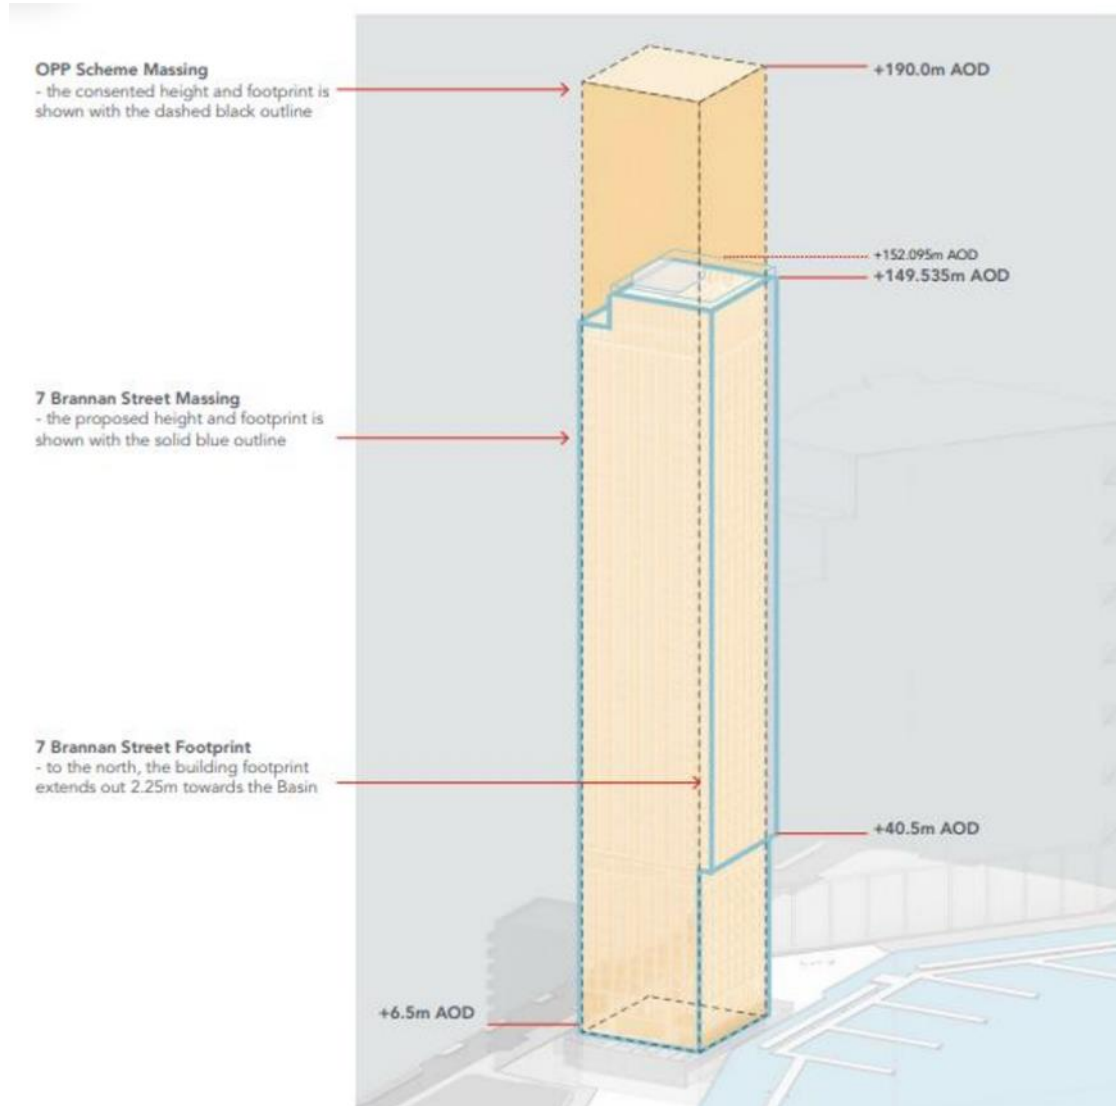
Image illustrating Wood Wharf Masterplan massing and application proposal massing (outlined blue)
